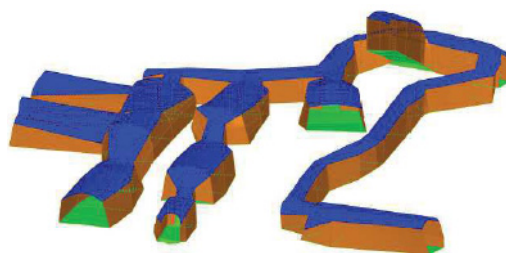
The 3D model of the wine cellar. The floors are highlighted in green, walls are brown, and ceilings are blue (Janičková et al., 2016).
